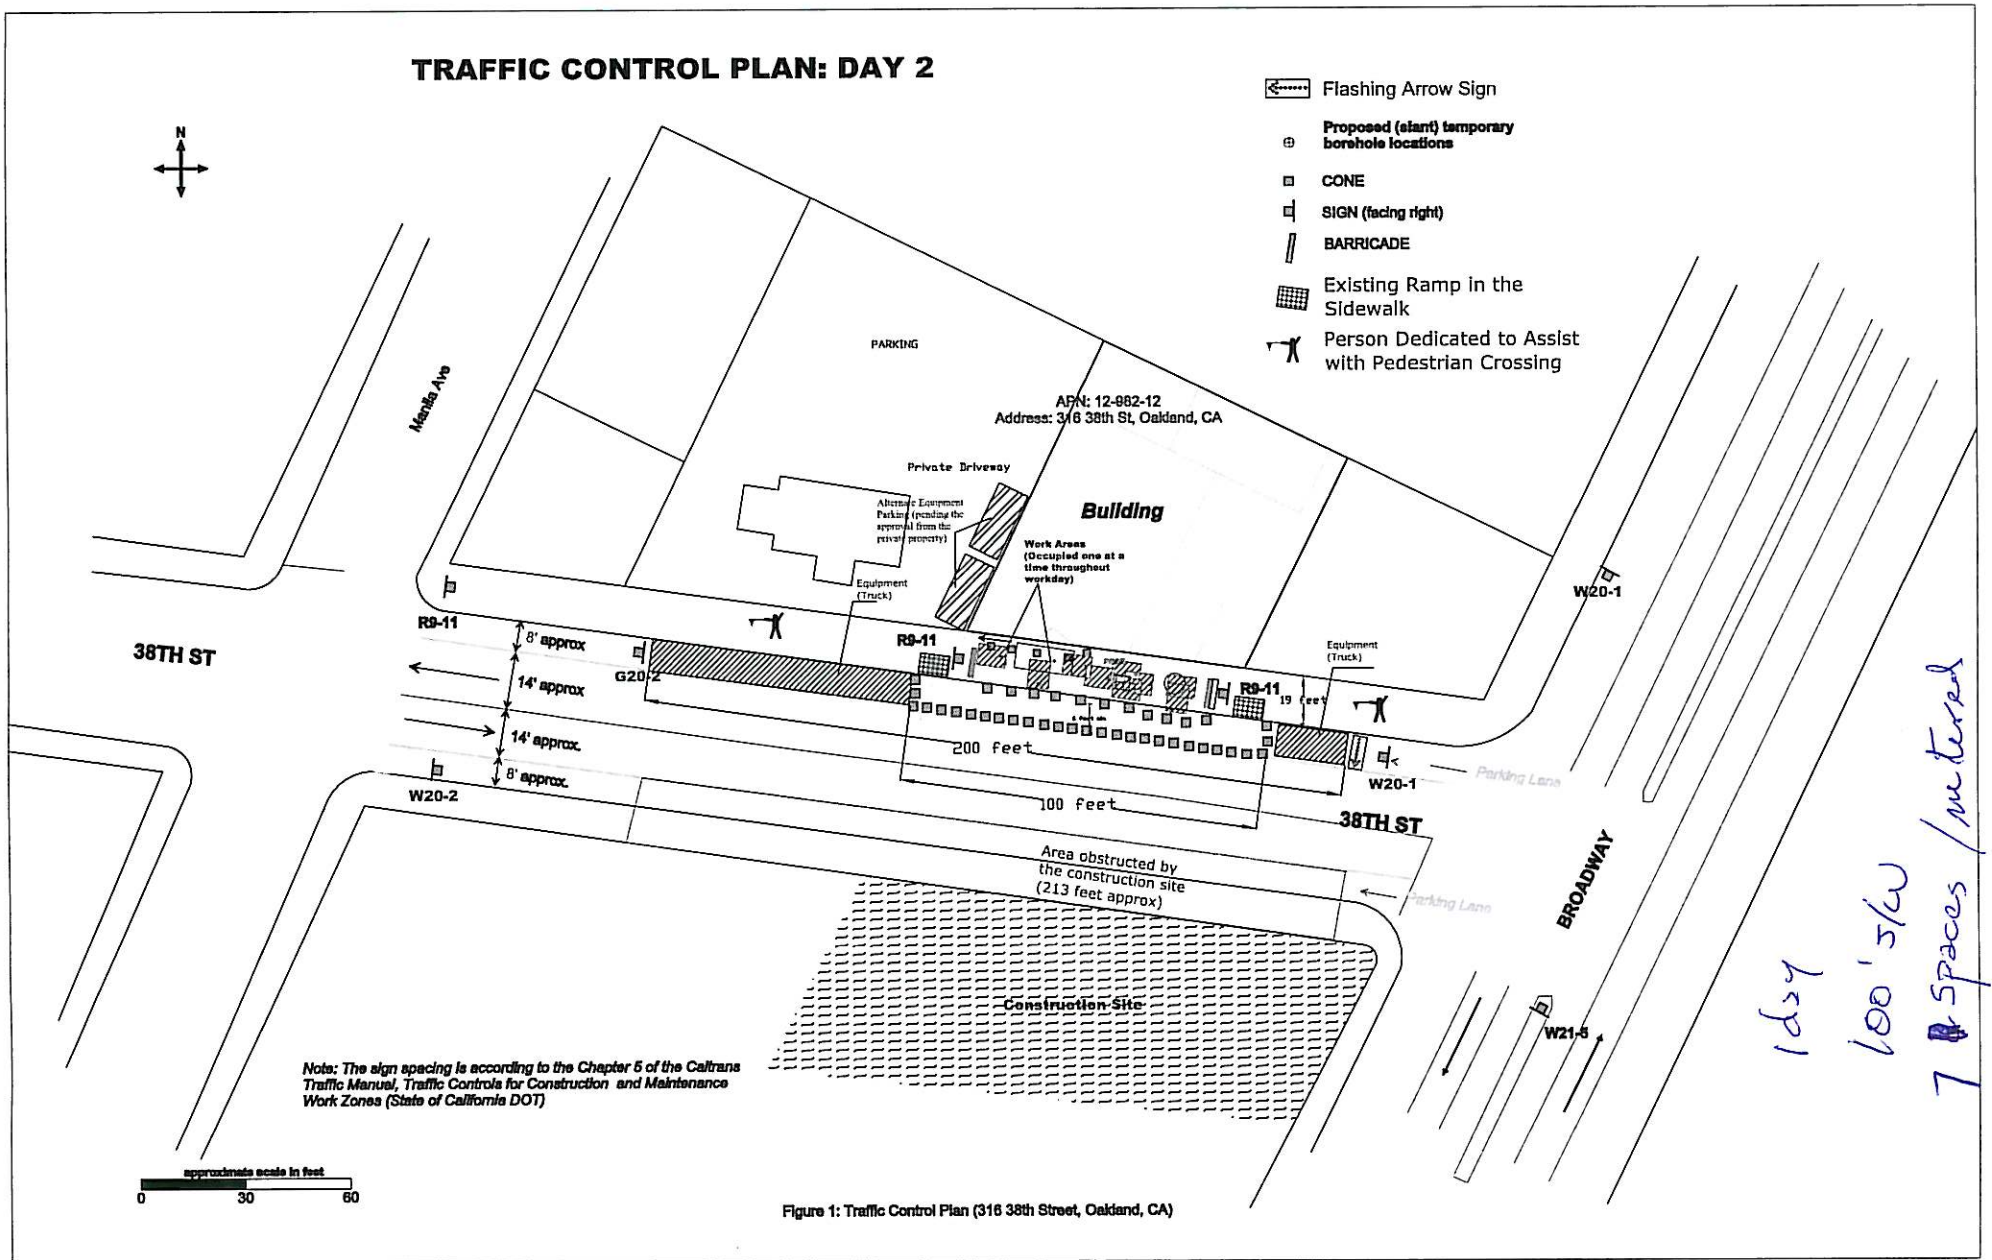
Traffic Control Plan (316 38th Street, Oakland, CA)
